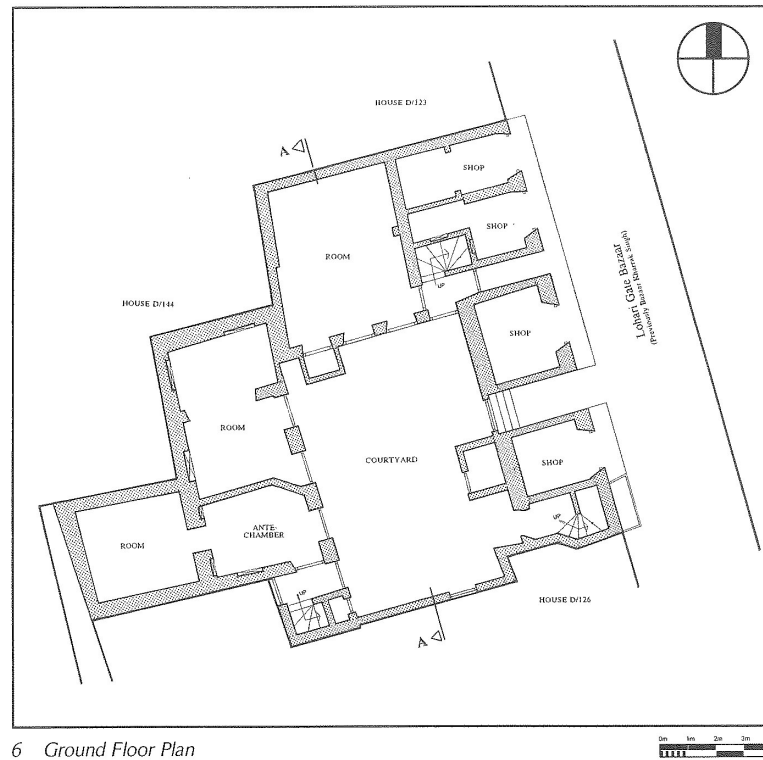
Ground Floor Plan of Haveli in Lahore Mandi Bazaar.
